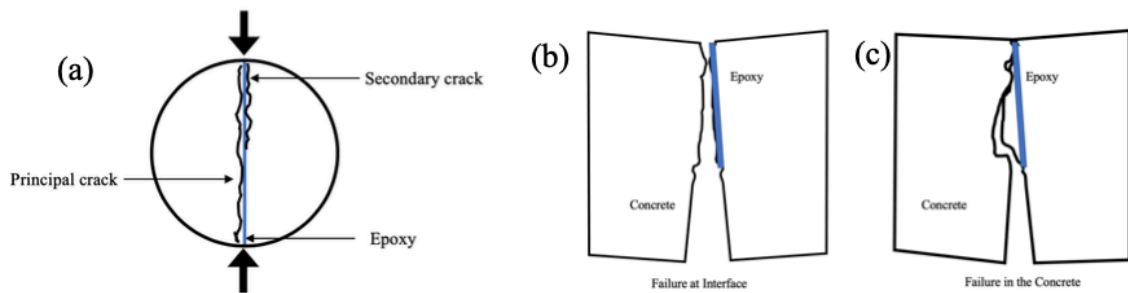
adapted from (Coronado and Lopez, 2008): (a) Sketch of Splitting Tension Failure Mode; (b) Sketch of notched beam failure at Epoxy-Concrete interface; and (c) Sketch of notched beam failure within the concrete
